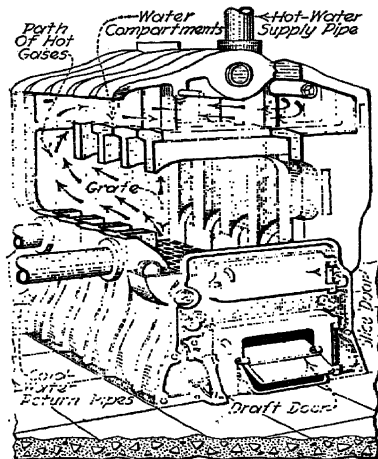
Typical medium-size, hot-water heating boiler. In general, the same boilers may be used for both steam and hot-water heating but steam space must be allowed above the water in a steam boiler. (American Radiator Co.)
